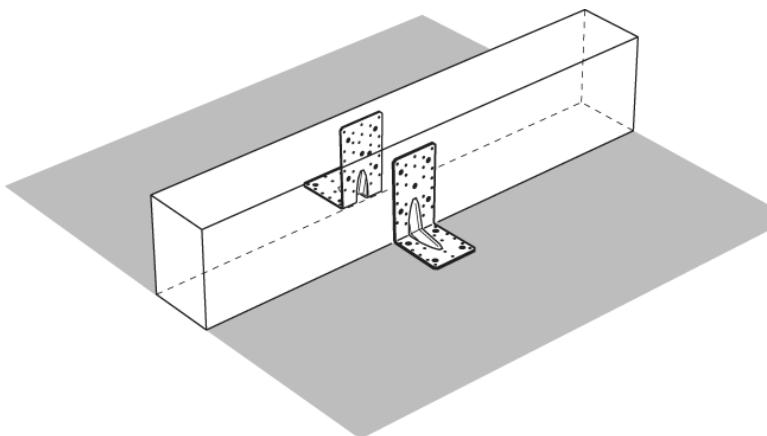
BEAM TO RIGID SUPPORT WITH BOLTS
